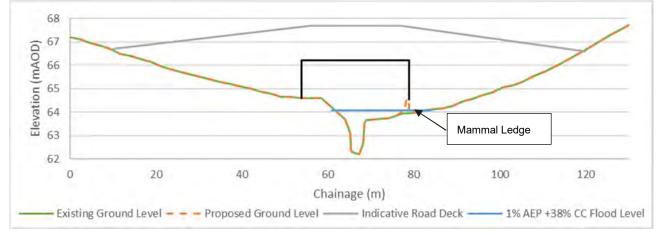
Proposed bridge at ESTO01\_16731BU
